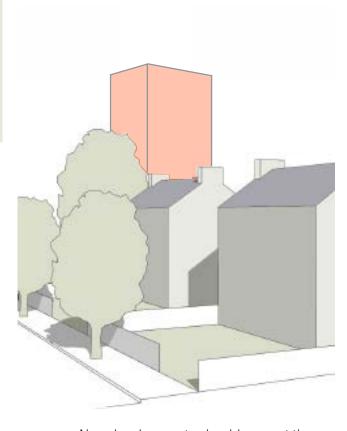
New developments should respect the existing shape and rhythm of skylines and designers should make sure that new buildings do not obstruct views to local landmarks such as the Church Tower
